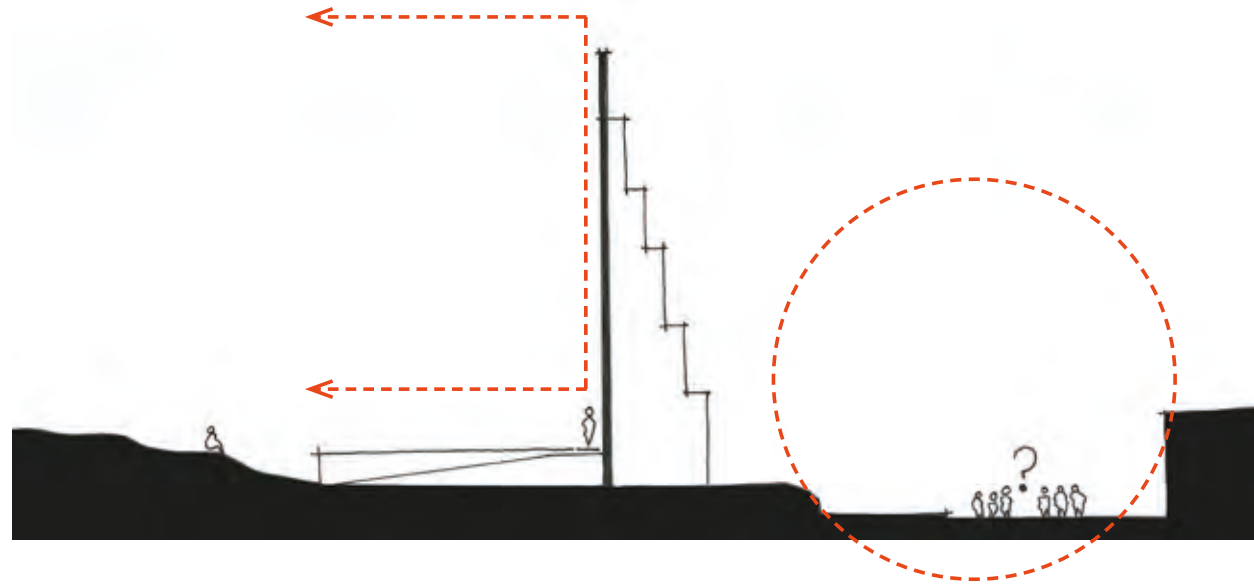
Sectional diagram depicting street permeability (Van Staden 2021).
